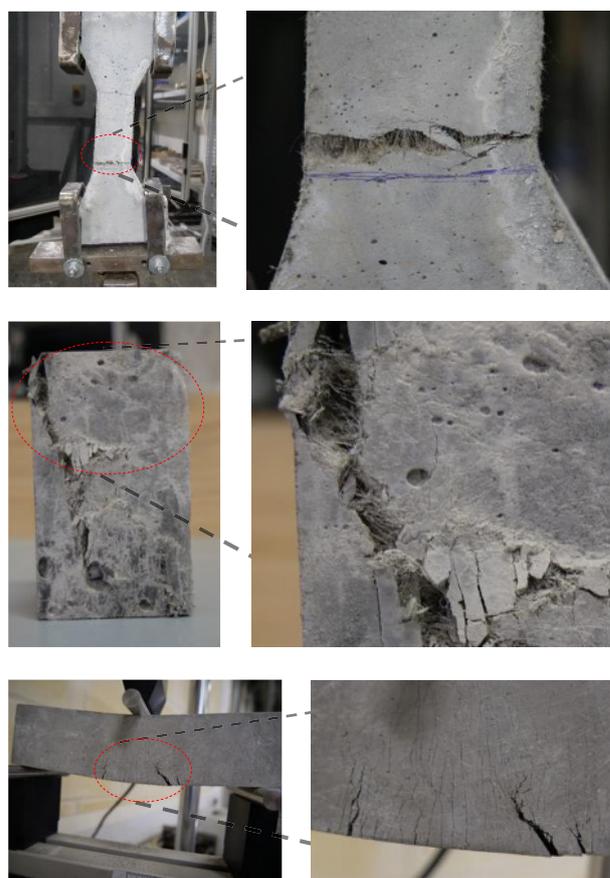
(Top) Dogbone specimen after failure, (Middle) PE fibers bridging a crack, (Bottom) Multiple cracking during bending test
